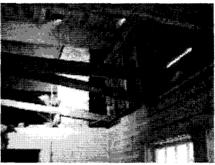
Roof/ceiling joists and chimney, evidence of a previous one story structure.
